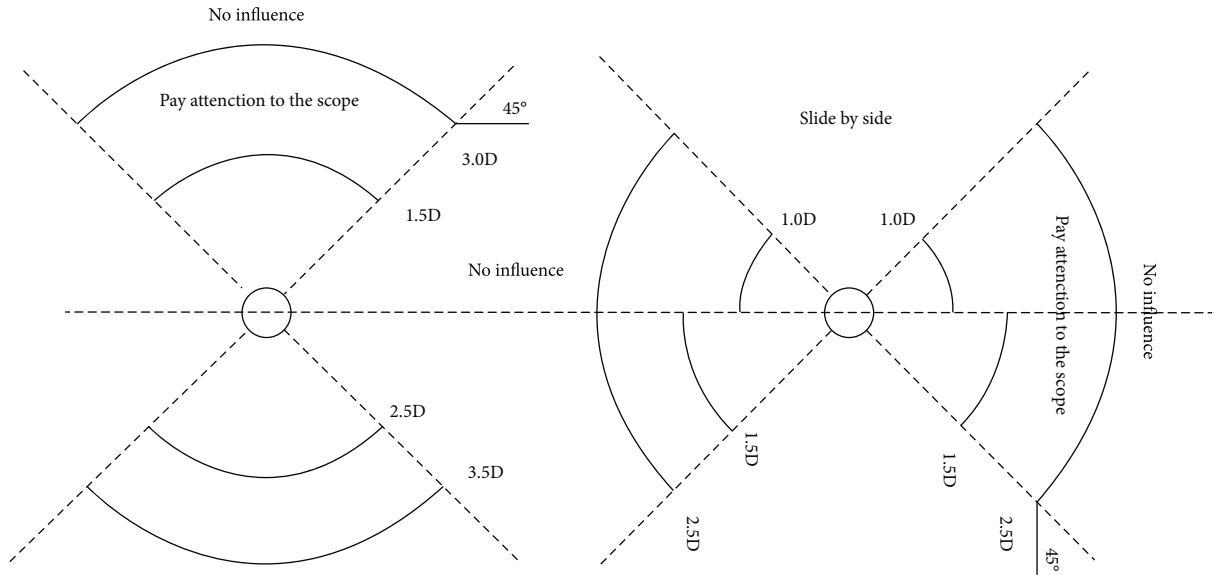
Dividing the proximity of a new tunnel through an existing tunnel.
